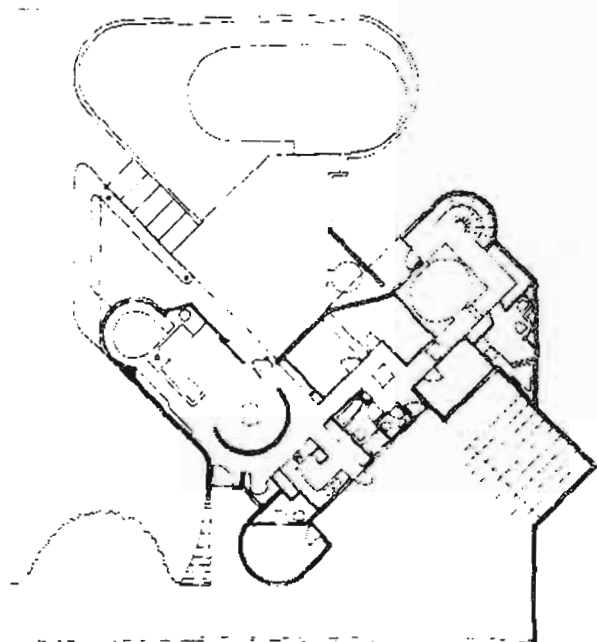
BDG – House Burgess (1973). Plan. Ref: *Plan* 74.3: p11.
